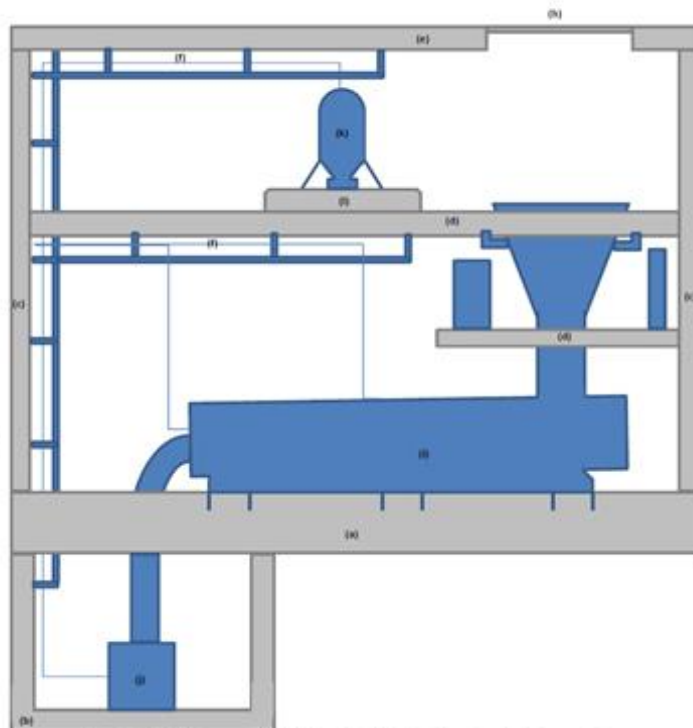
Kiln Facility cross section (looking North, with South external walls removed)
